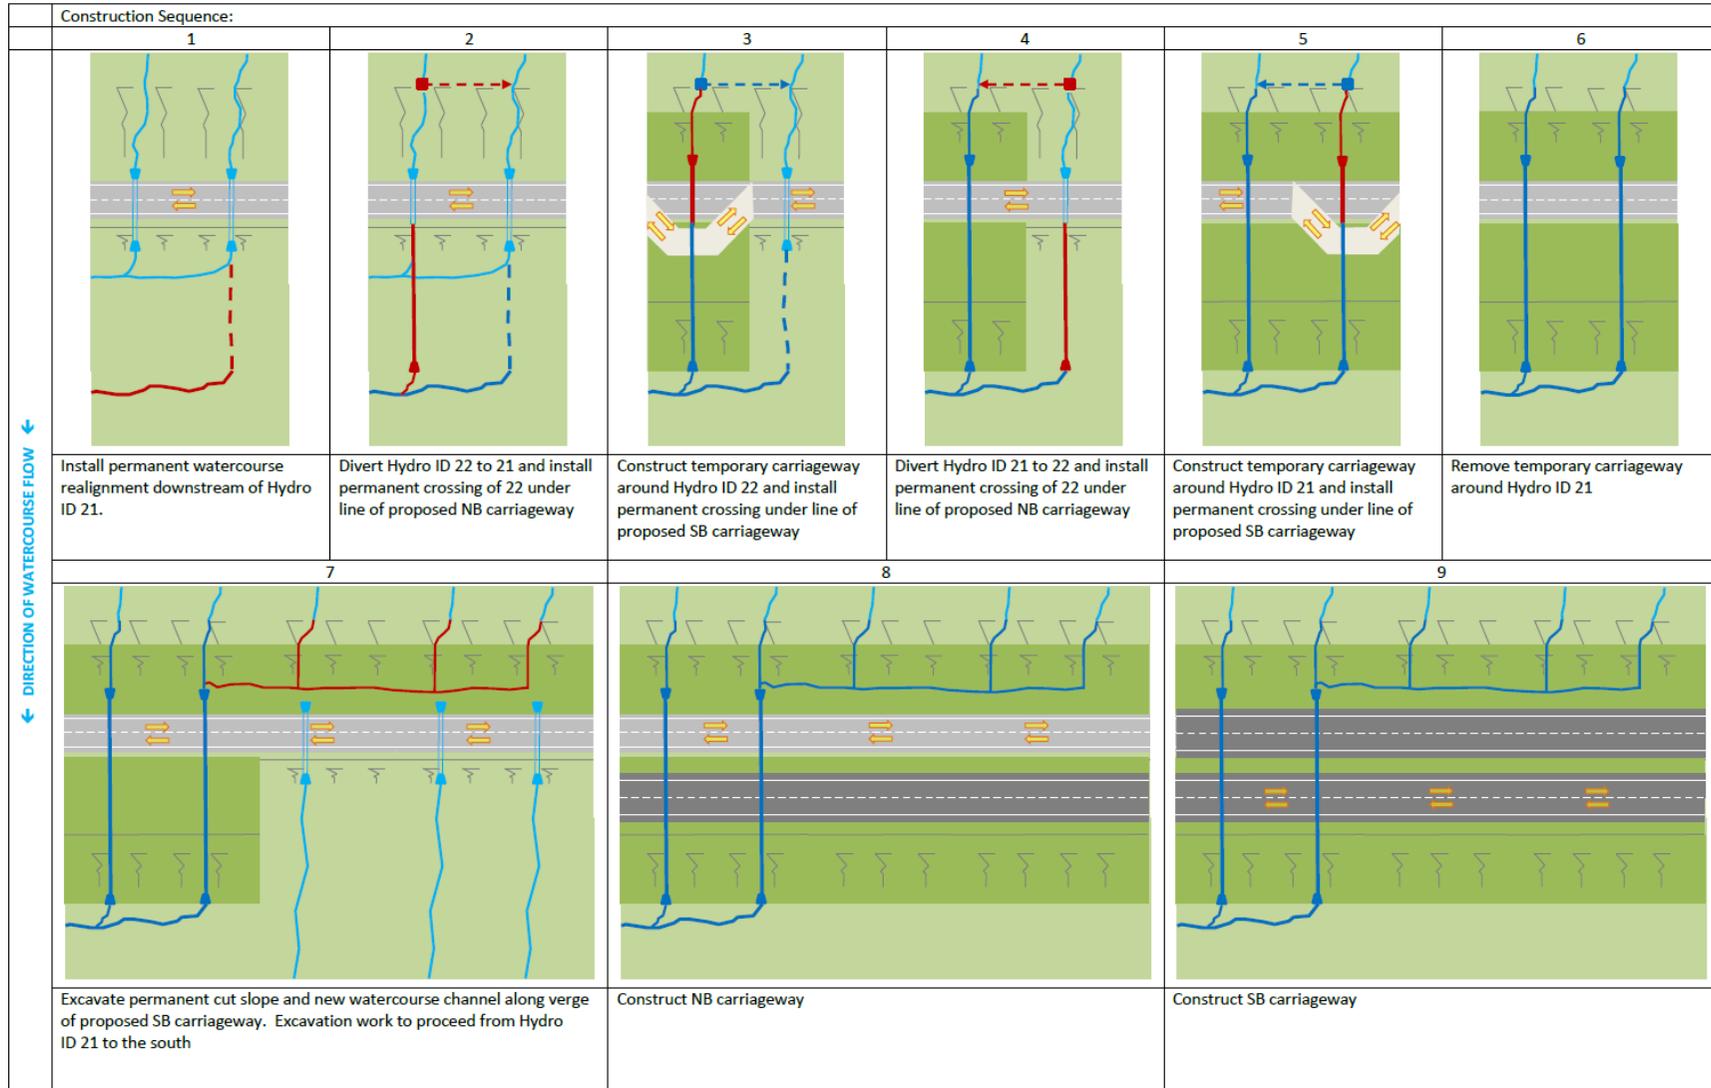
On-line watercourse alignment – widening to the east (road in cutting) and widening to the west (road on embankment)
